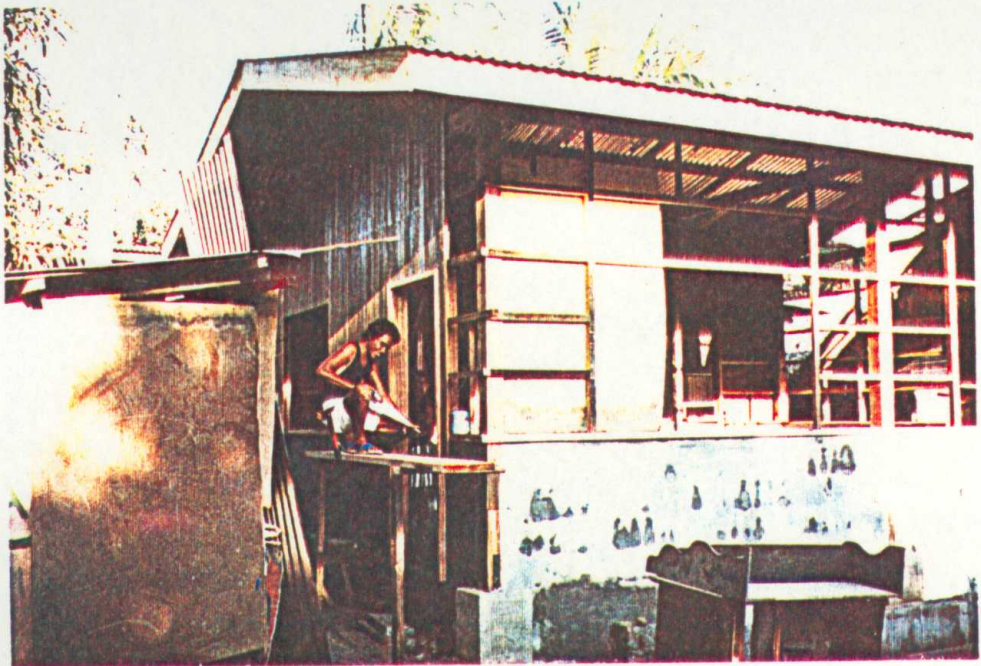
Cash-economy equivalent that comprises most of the residential building stock in urban areas and larger villages. Houses are built by professional carpenters with timber frames of processed timber, ground floor of masonry (concrete blocks) and light roof cover sheets.
